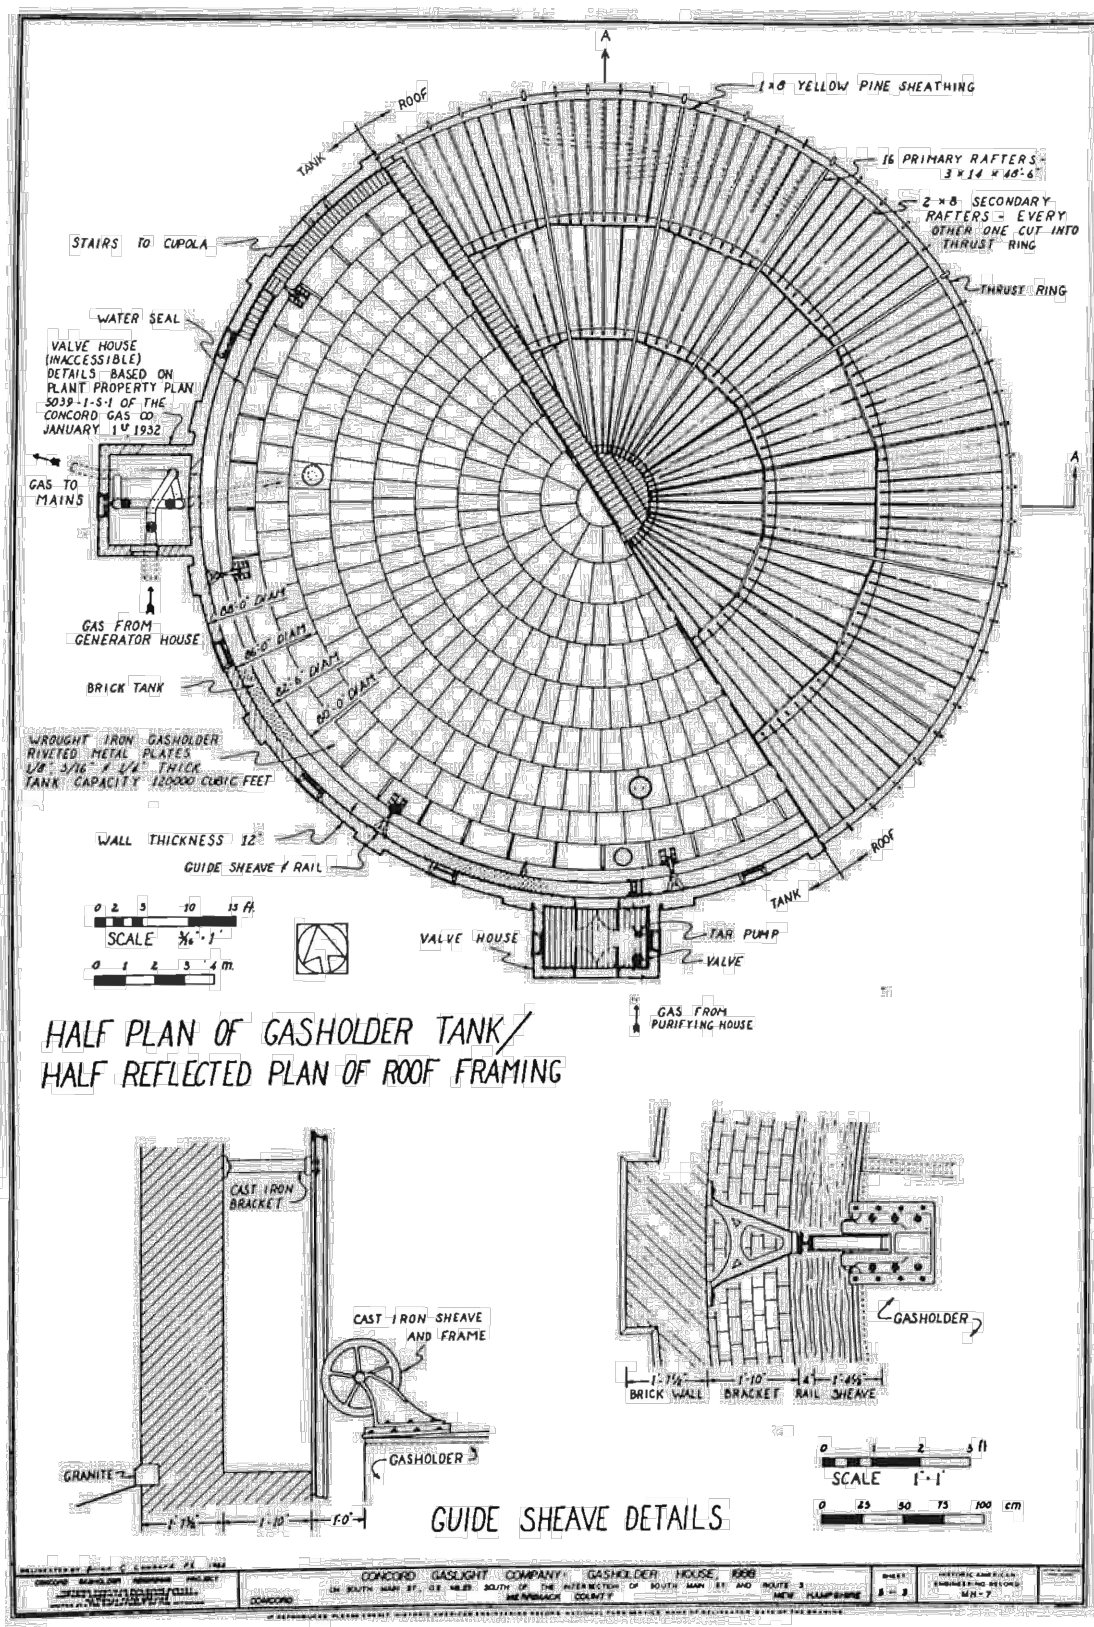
Roof plan and details of guide sheaves. HAER, drawing by Brian Lombard, 1982.
